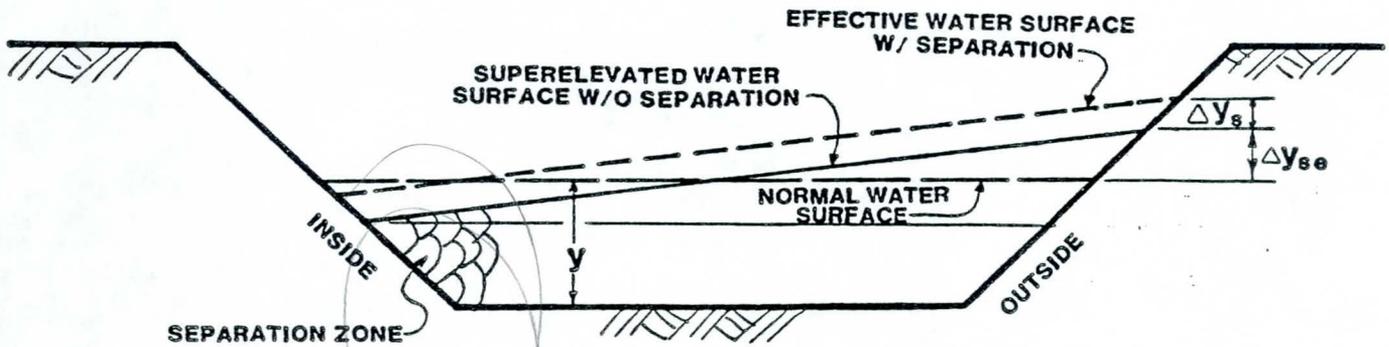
Definition sketch of superelevation and flow separation conditions in a short radius bend.
